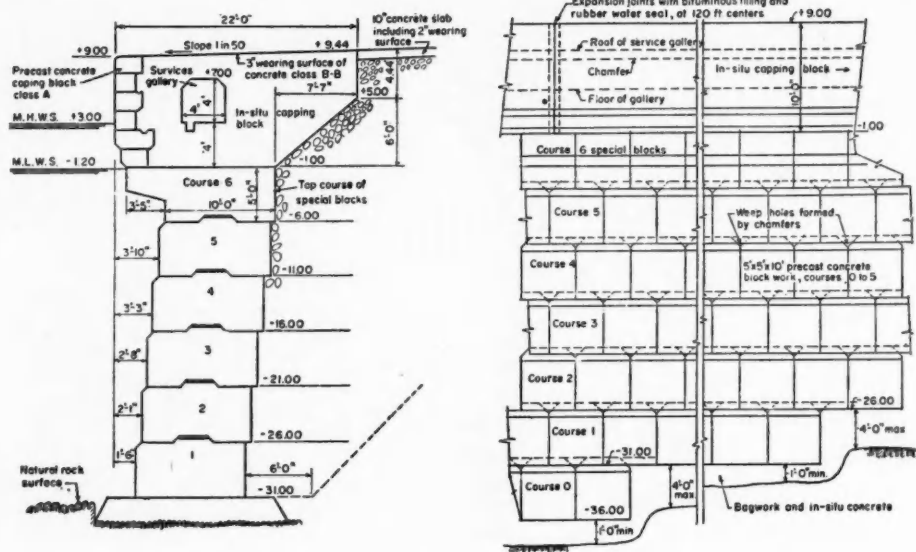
Typical cross-section and elevation of the wall for No. 2 Quay.
